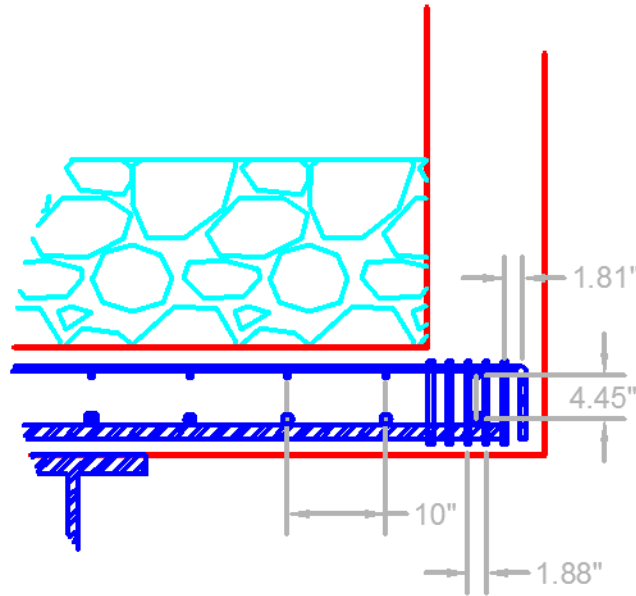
Drawing #3: Reinforcing Detail from Section A-A
